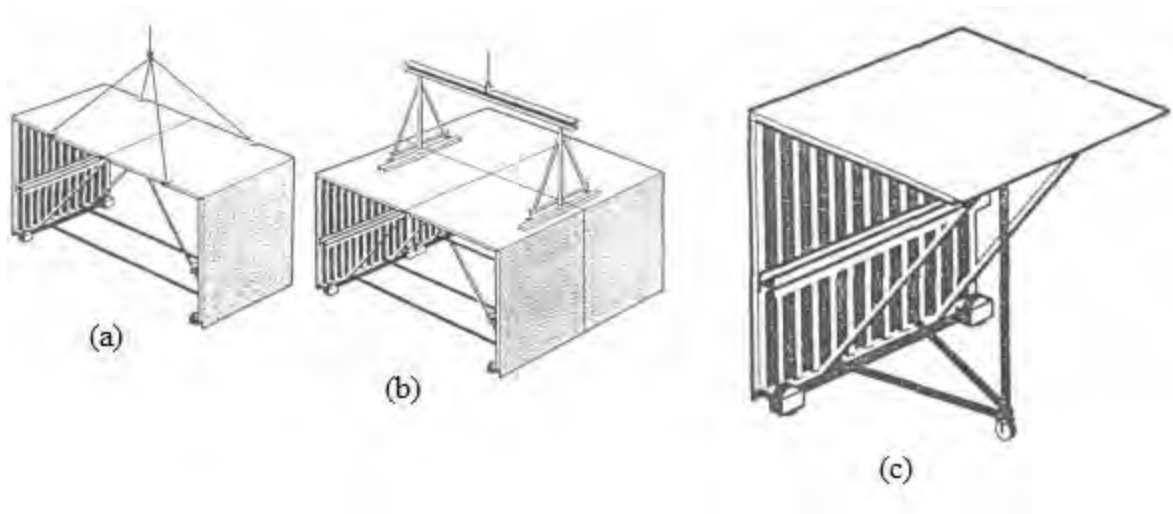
(a),(b) and (c) Tunnel formwork system (NurayBenli, 2005)
